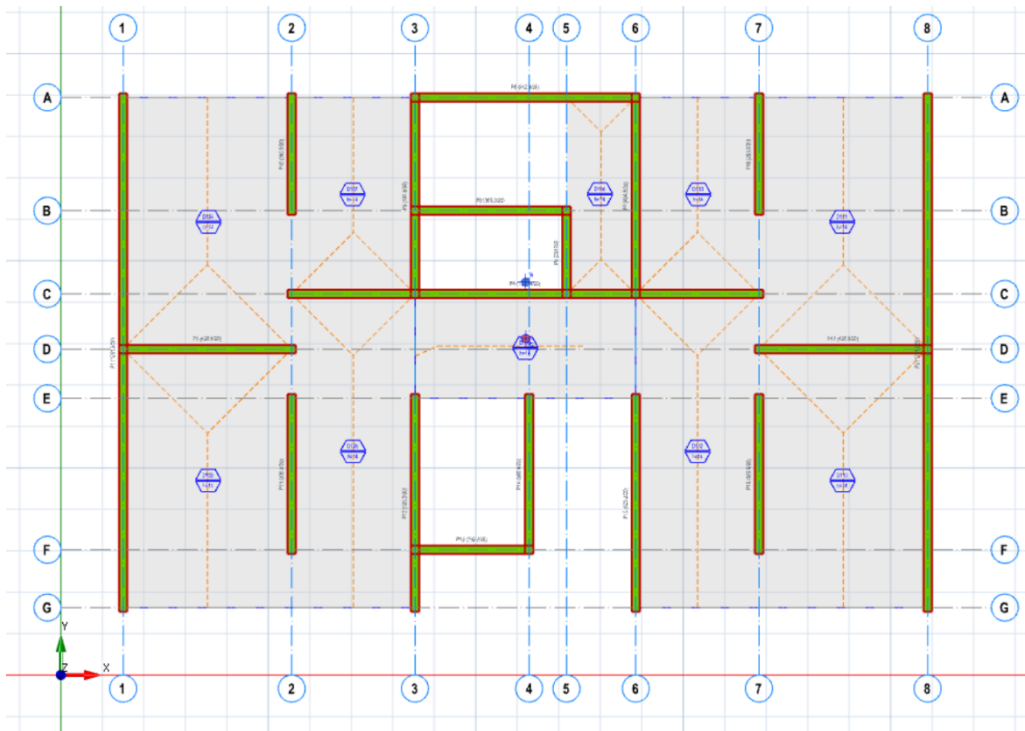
Floor Plan of Reinforced Concrete Model in ProtaStructure
